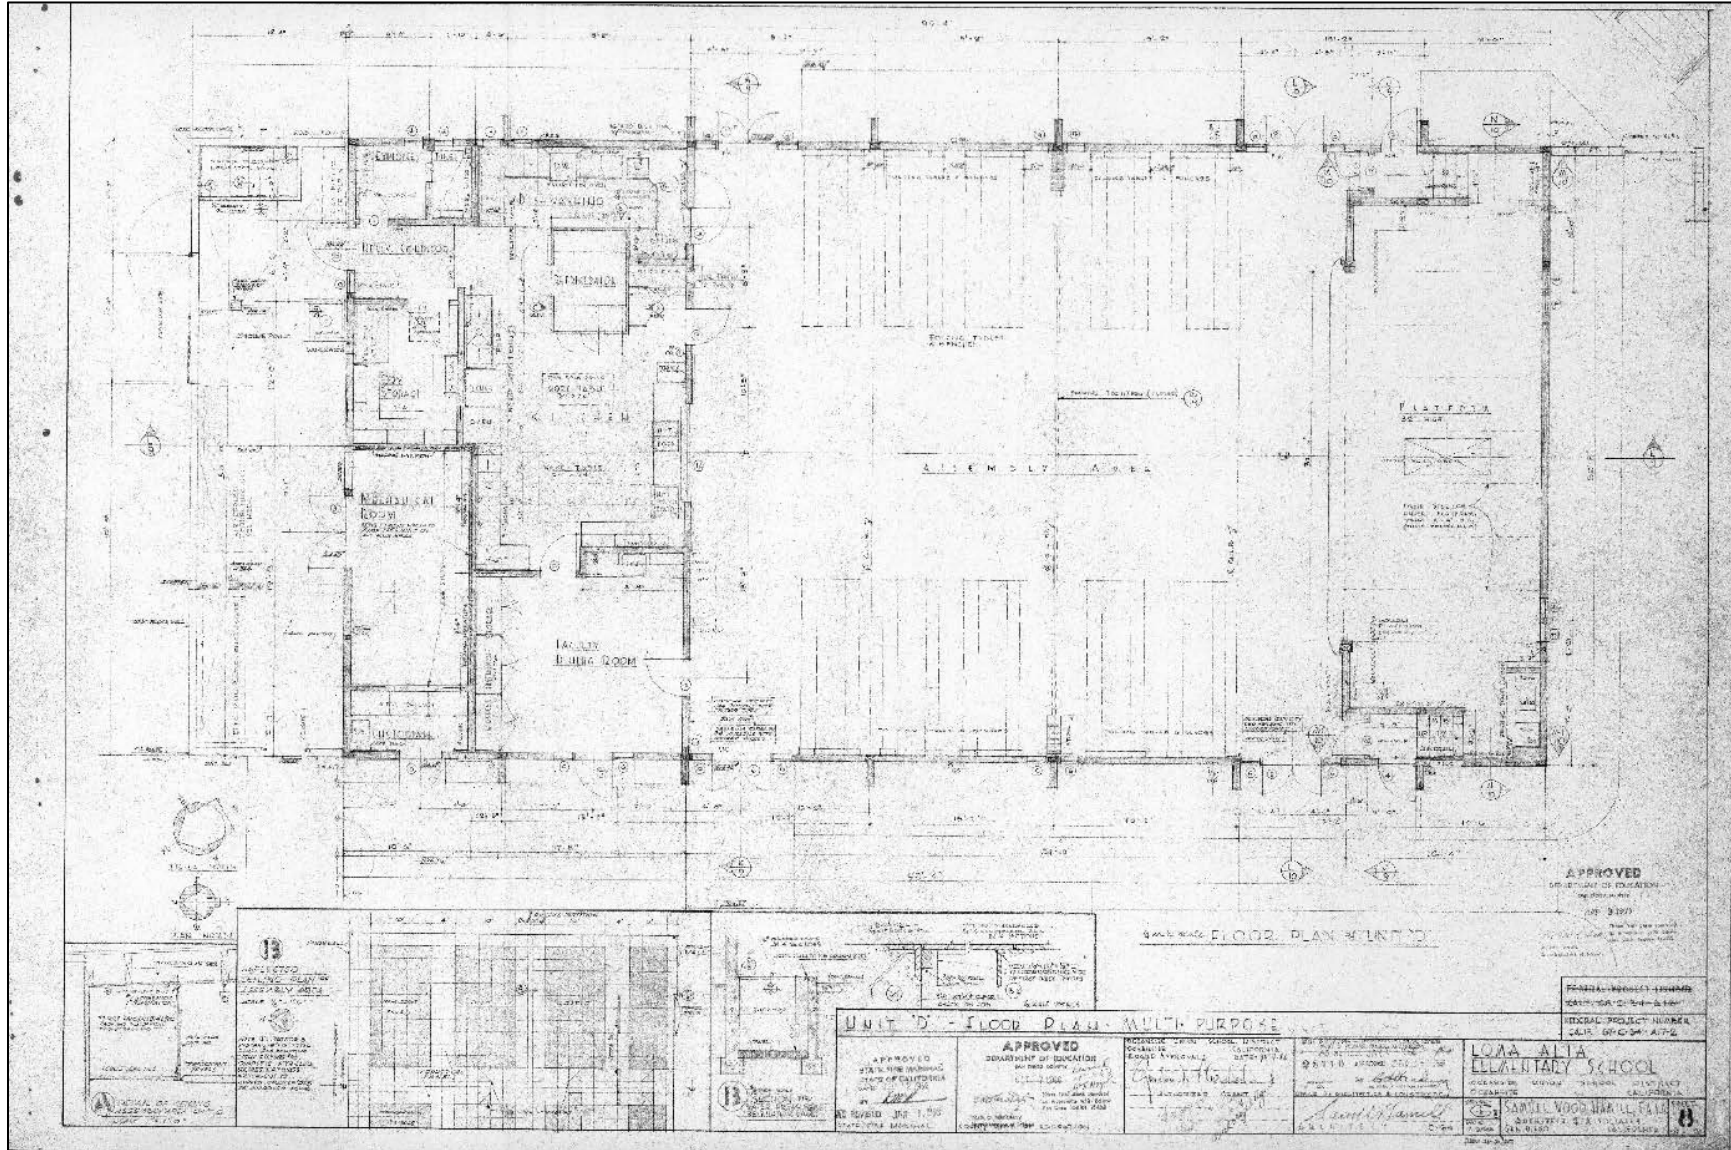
1966 Unit D Floor Plan Drawing, Sheet 8. Source: San Diego History Center.
